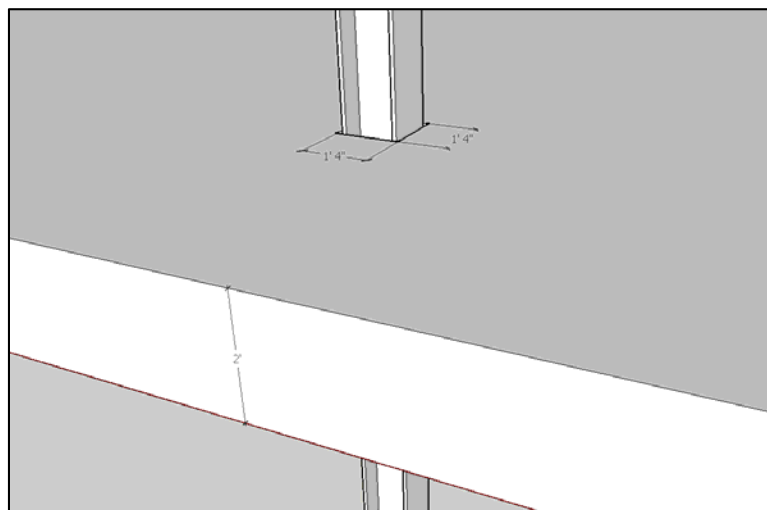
Conceptual 3-dimensional diagram of driving H-piles through rectangular holes cut in the existing concrete slab to support side walls for the picket weirs.
